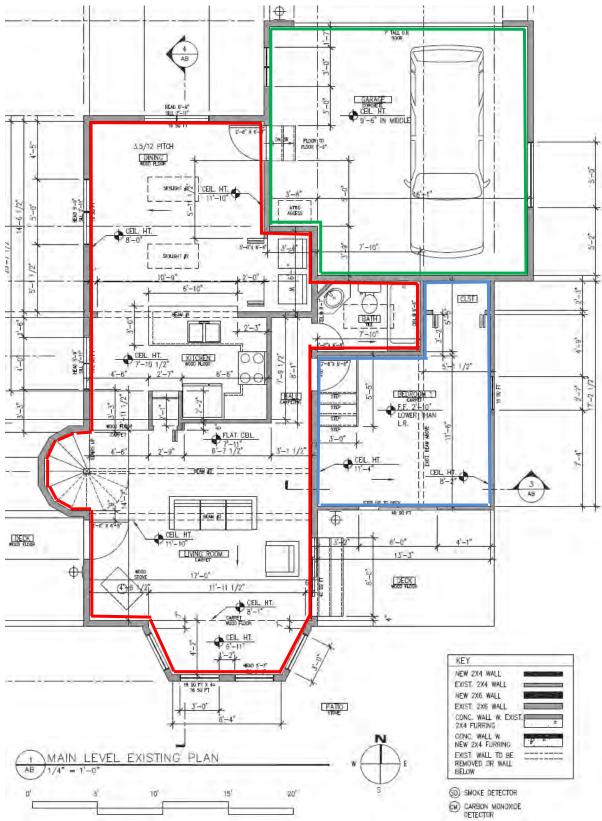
Existing residence main-level floor plan, with areas of differing elevation identified by red (highest elevation, including dining area, kitchen, and living room), green (middle elevation, garage), and blue (lowest elevation, bedroom)
